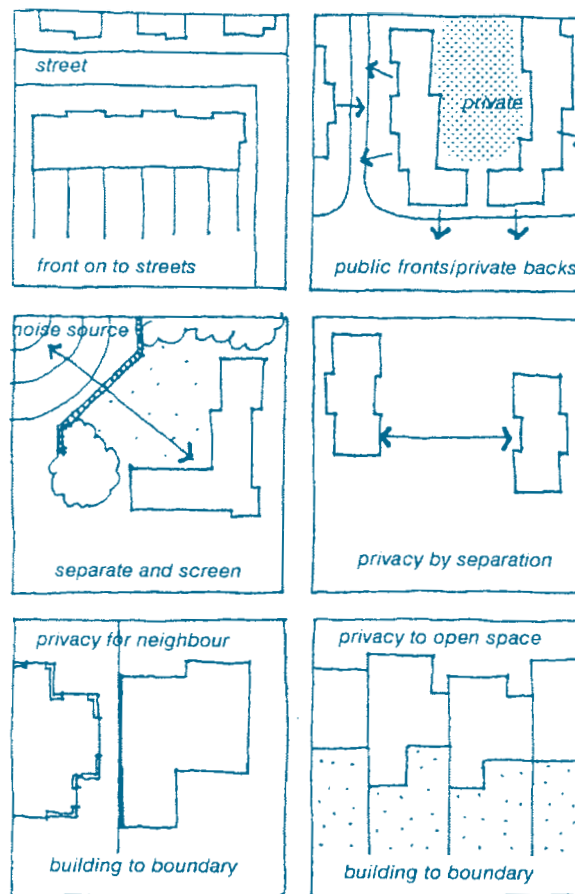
Privacy is a key consideration at the site planning and layout stage.
